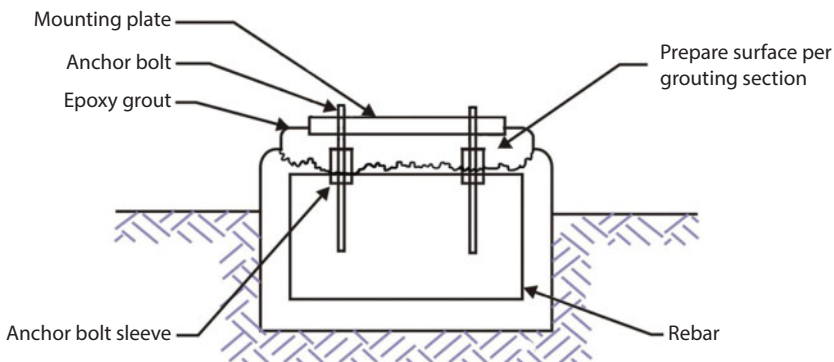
General overview of a typical equipment foundation which will support rotating equipment.
